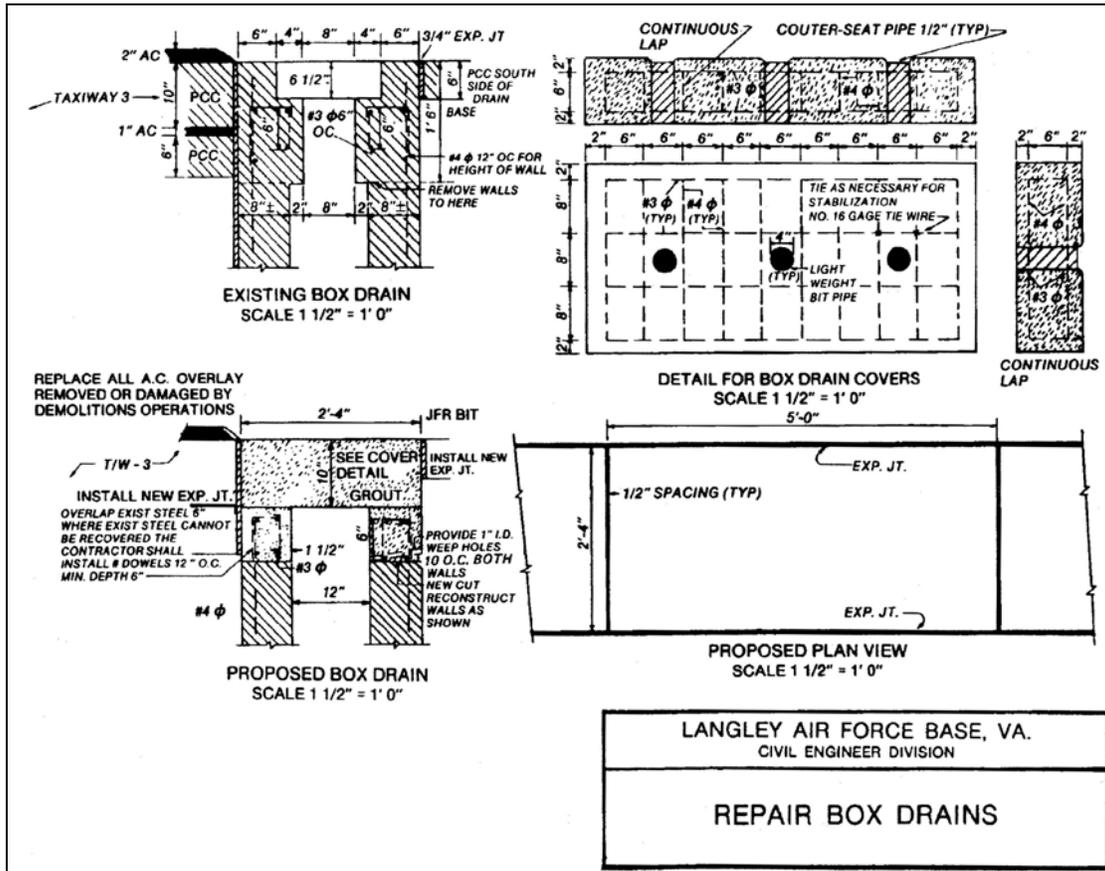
Typical Inlet and Box Drain Designs for Airfield and Heliport Storm Drainage Systems
